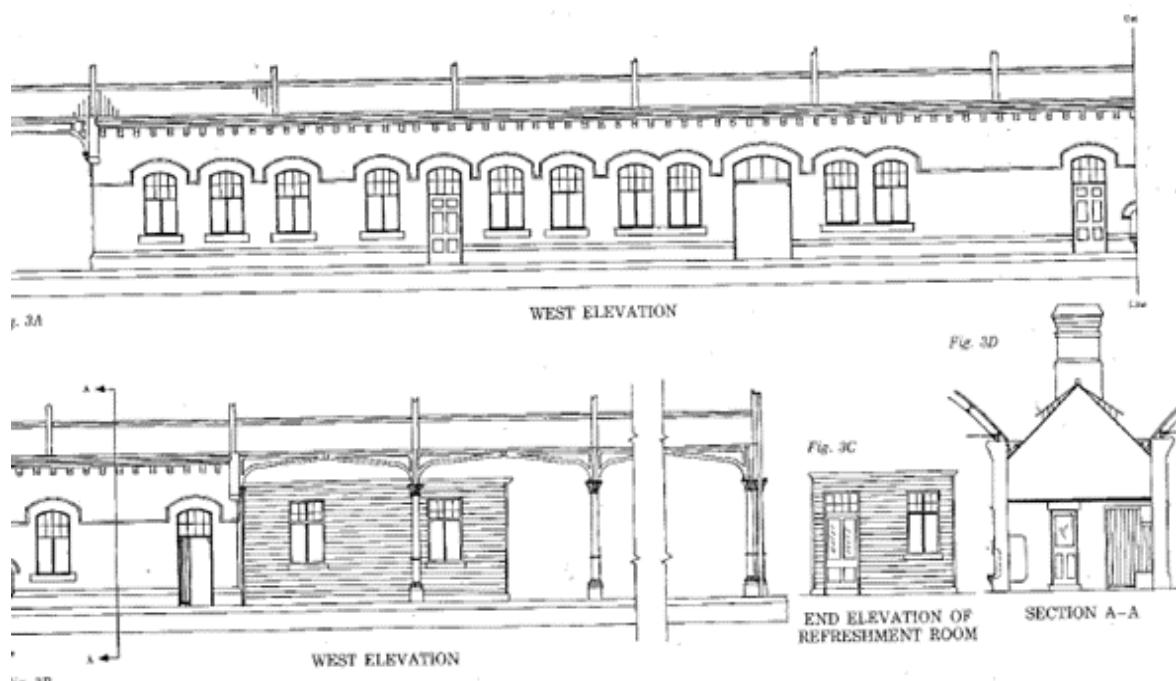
Elevations of the internal rooms, up the centre of the station platforms.
